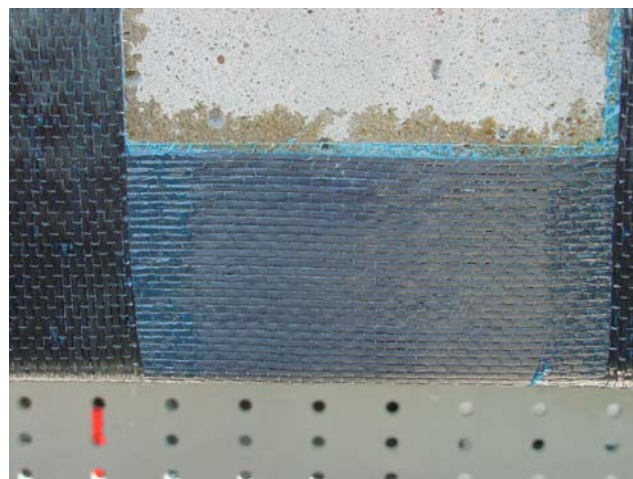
Matrix cracking in flexural CFRP in between stirrups.
